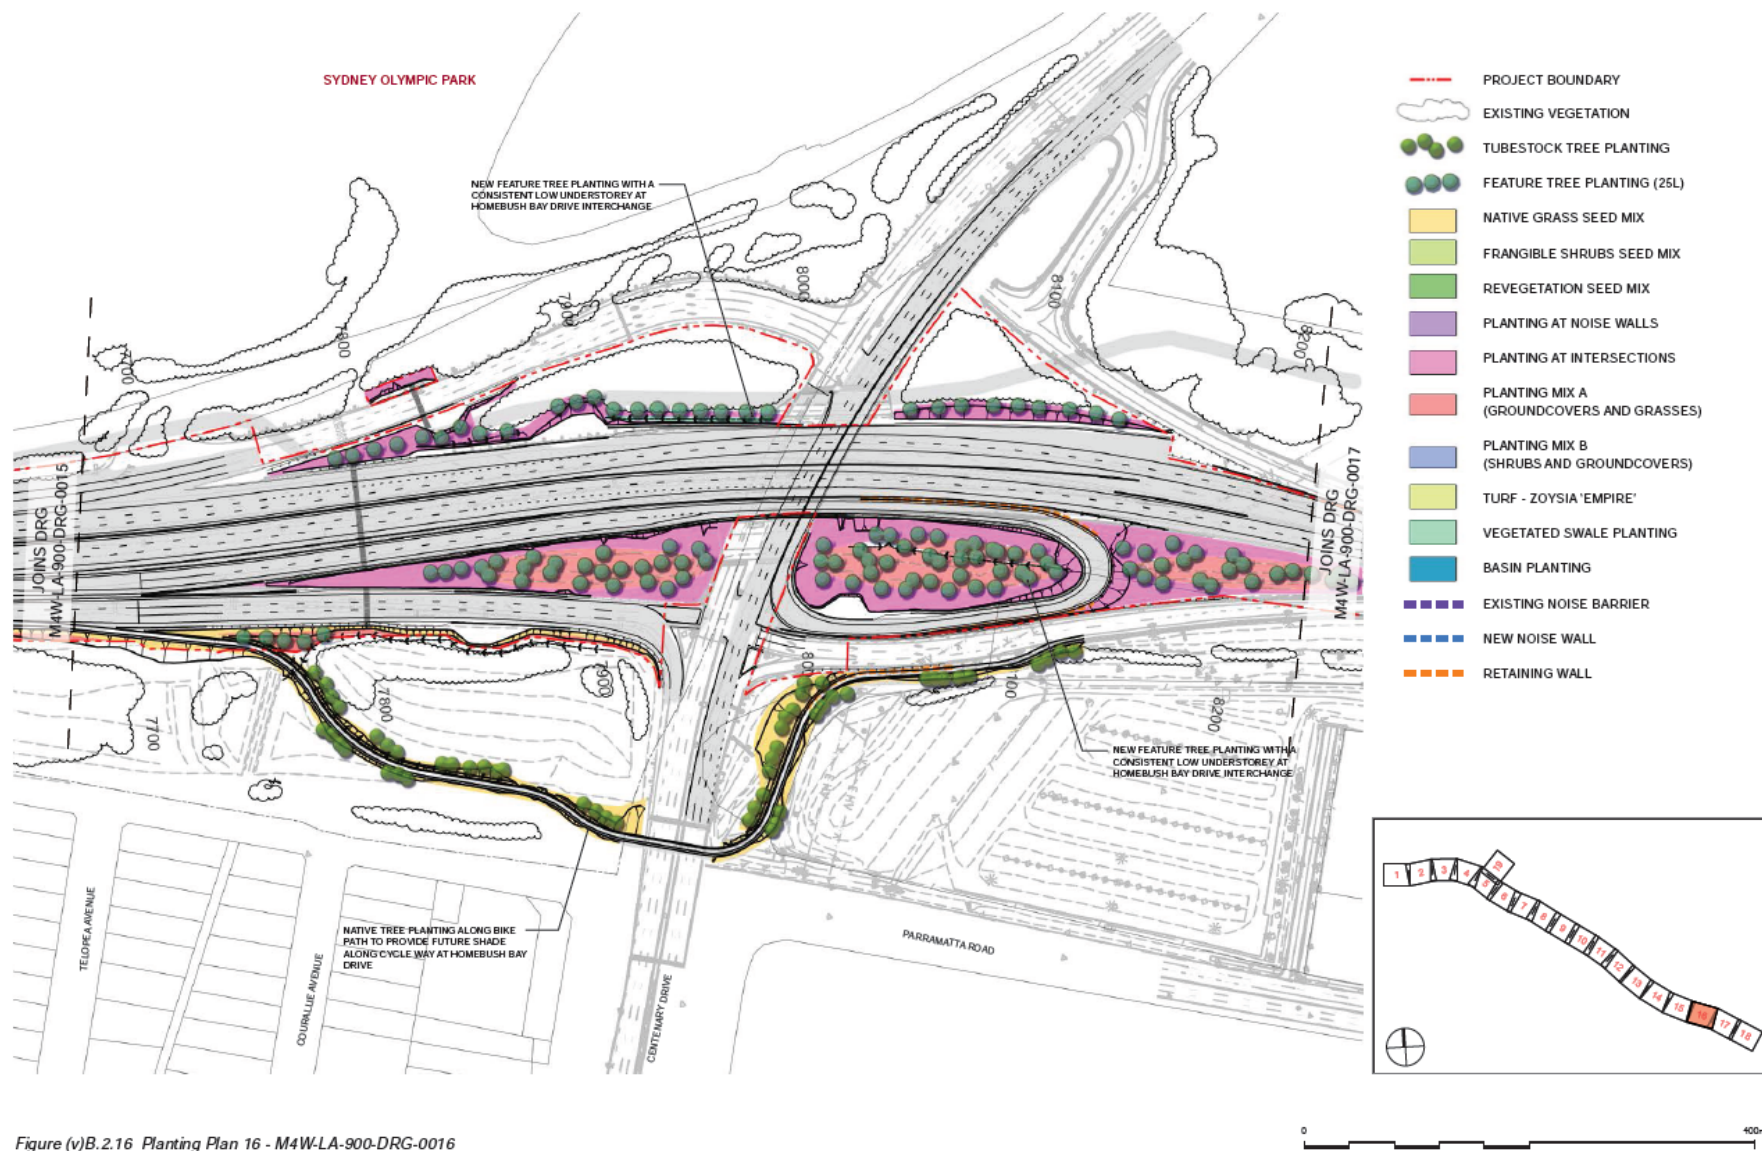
Planting Plan 16 - M4W-LA-900-DRG-0016
